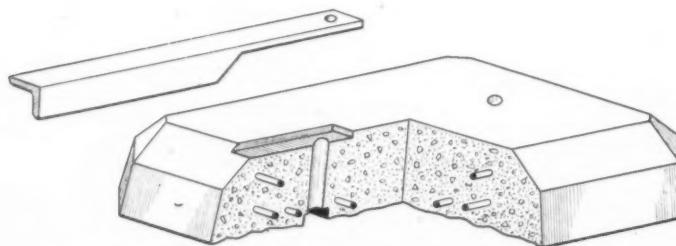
Section of a pot sleeper and plate used in removing it from mould
